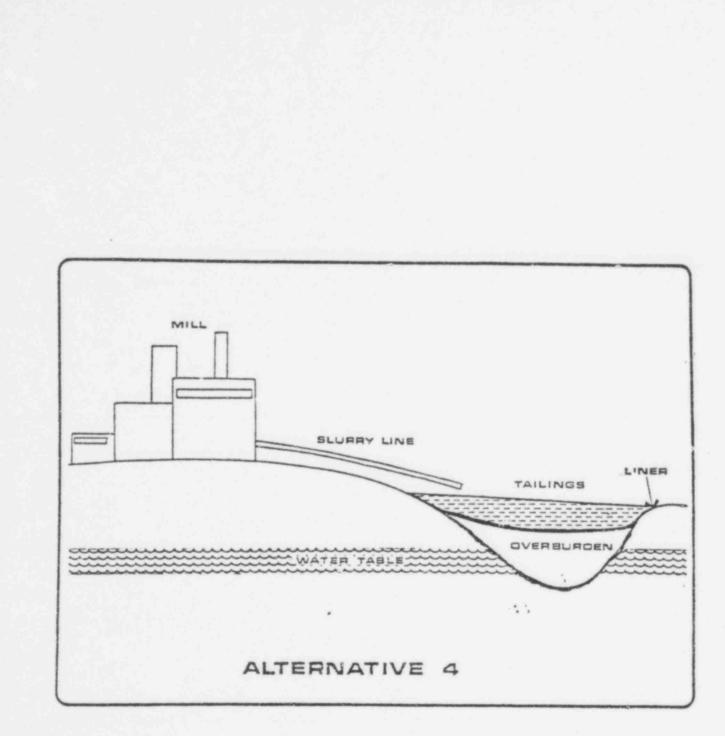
Untreated tailings deposited in filled and lined open pit mine, suitably covered.
